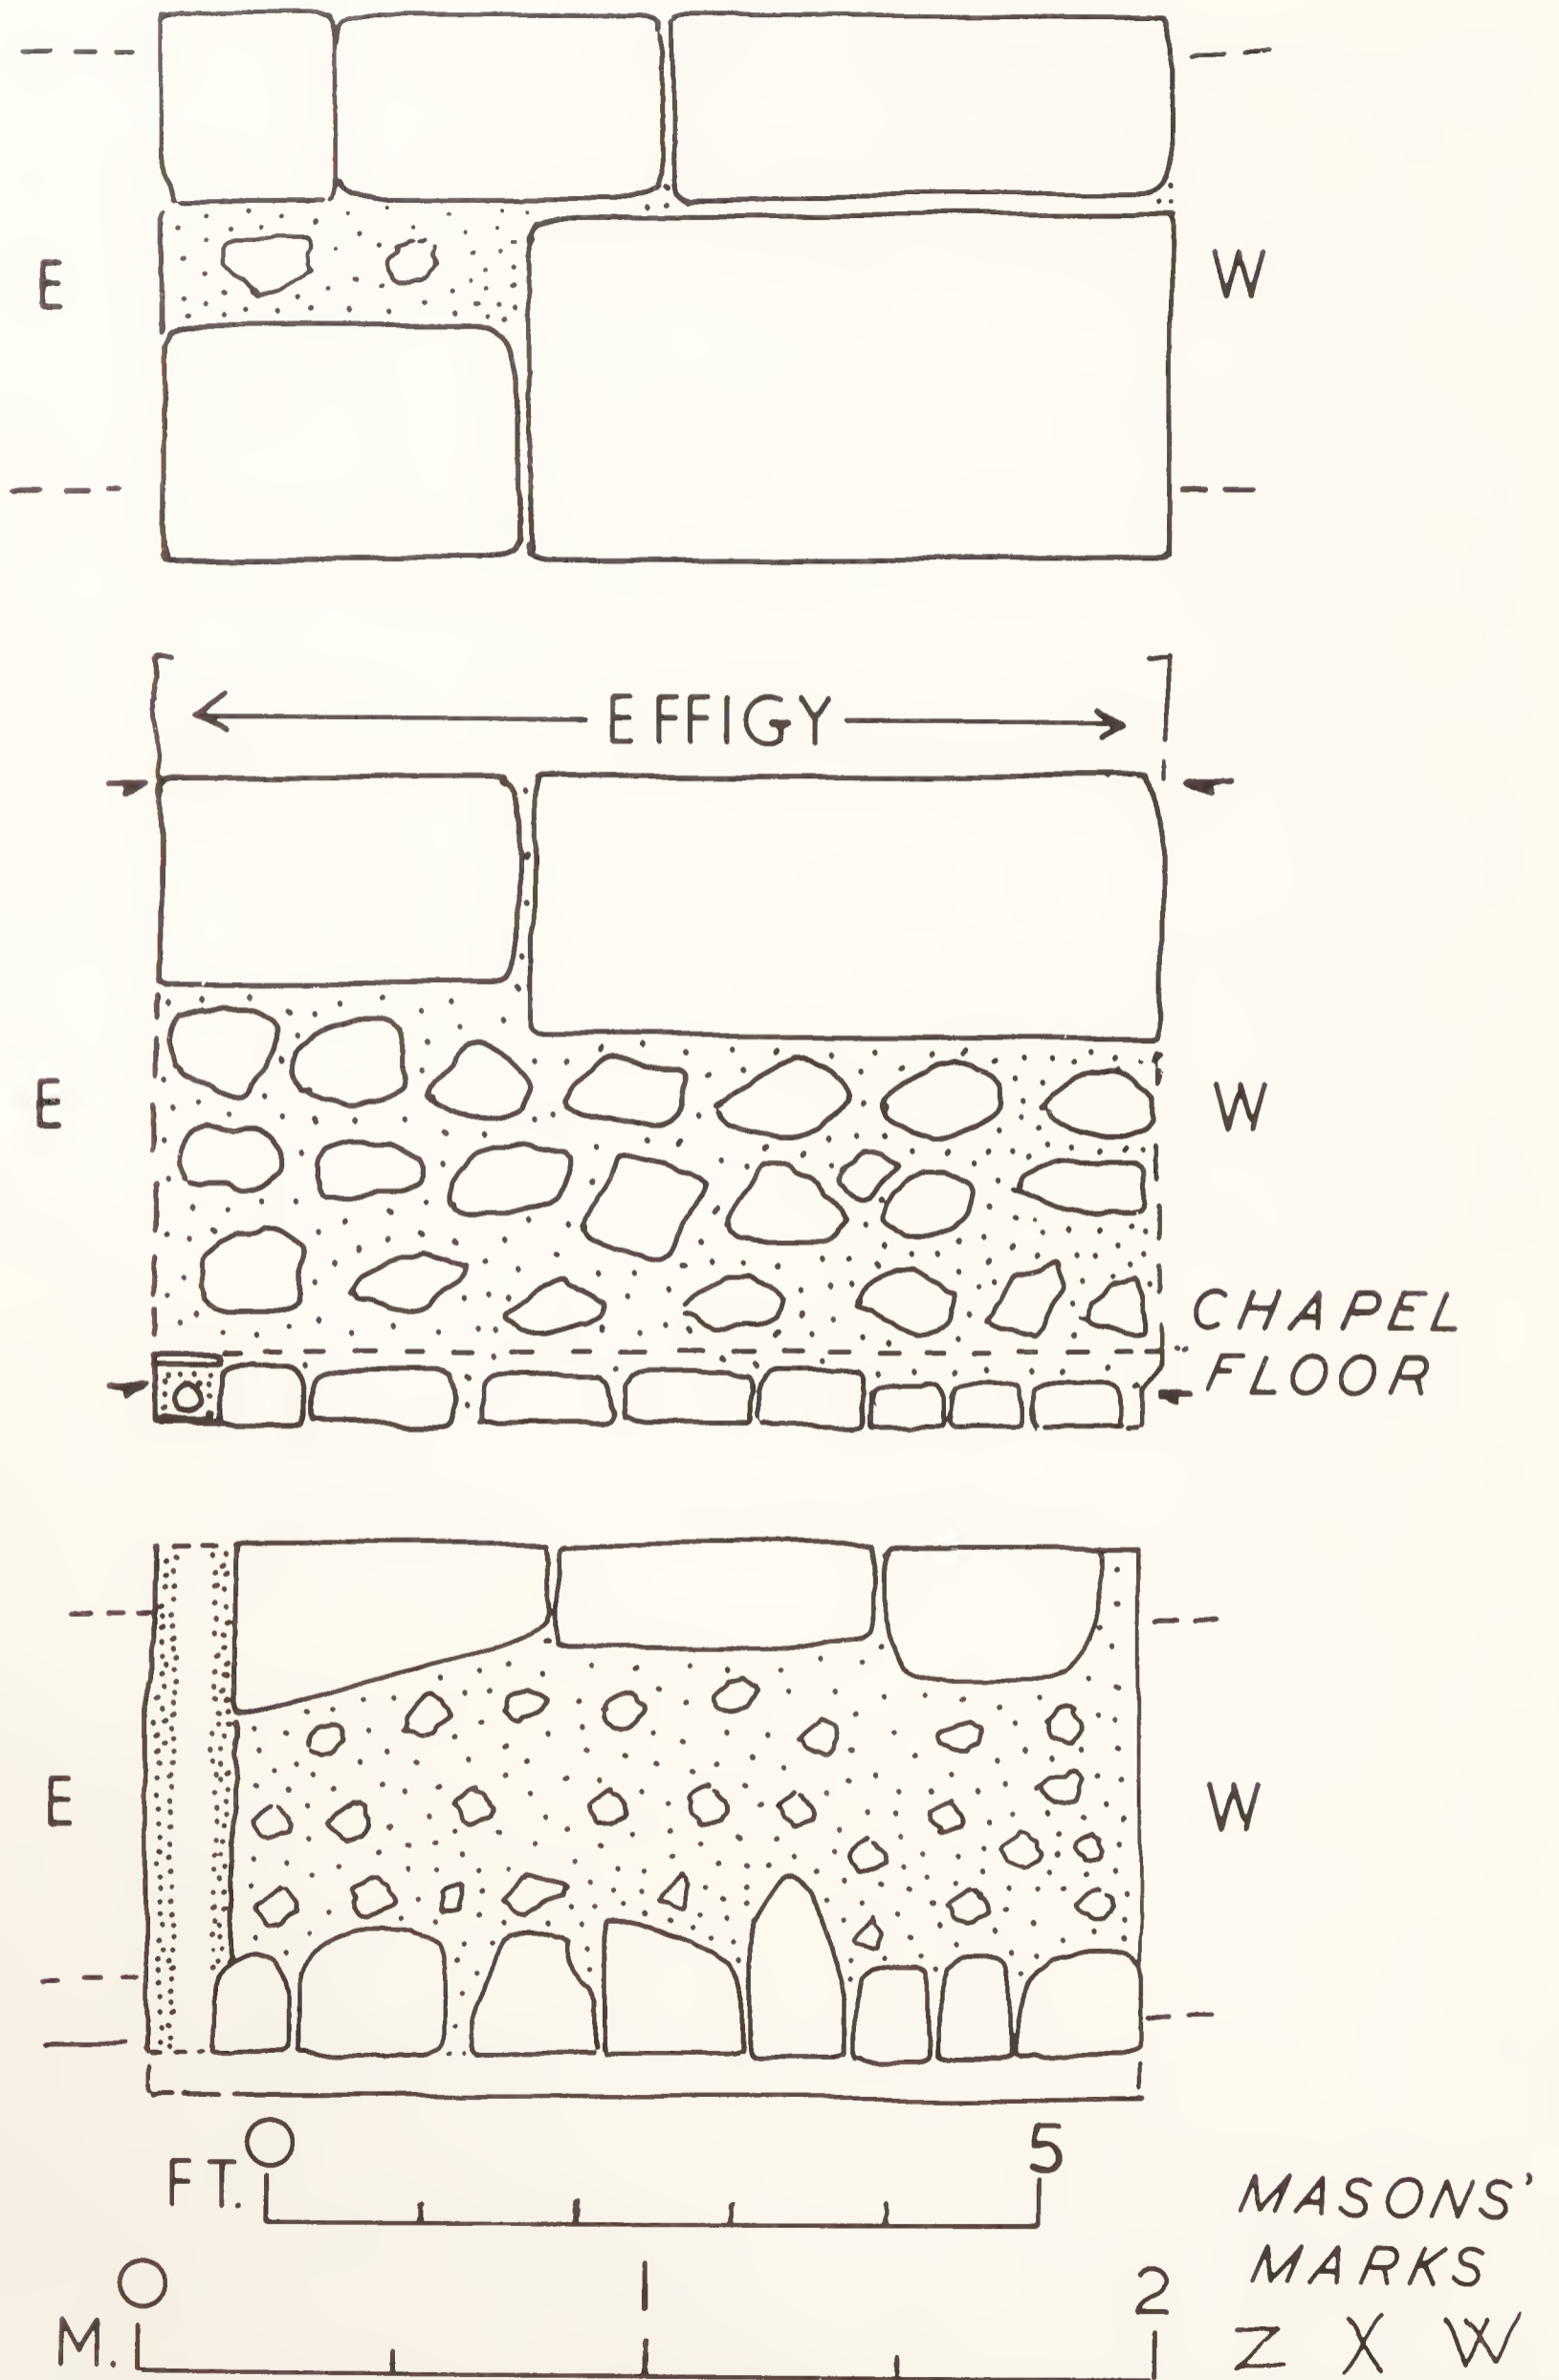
Harewood Church: plans and section of north tomb, plans at floor level and at tomb level: section looking south
